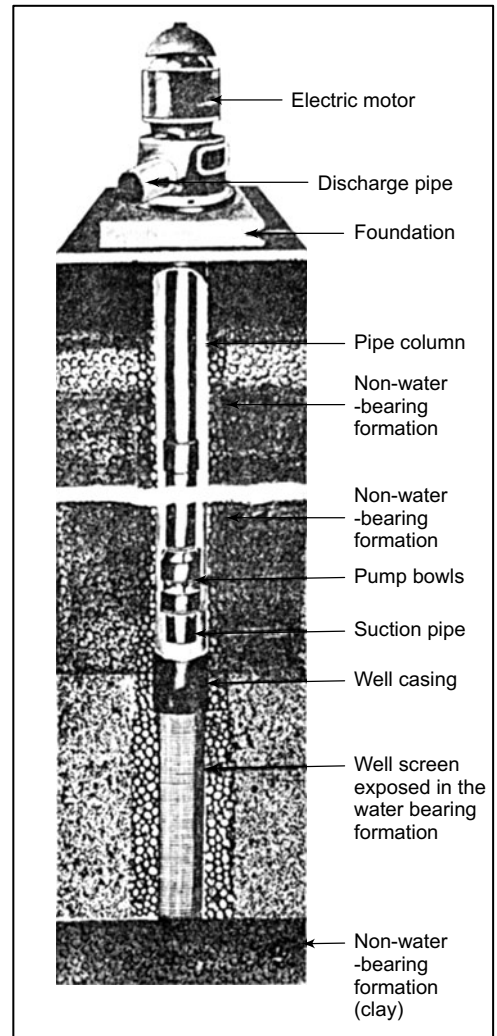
Sketch illustrating the installation of a vertical turbine pump in a tube well
